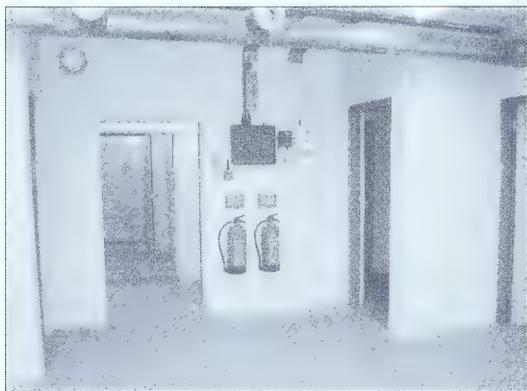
Blunsdon Emergency Water Control. View from workshop through the suite of decontamination rooms to the main blast-proof door.
